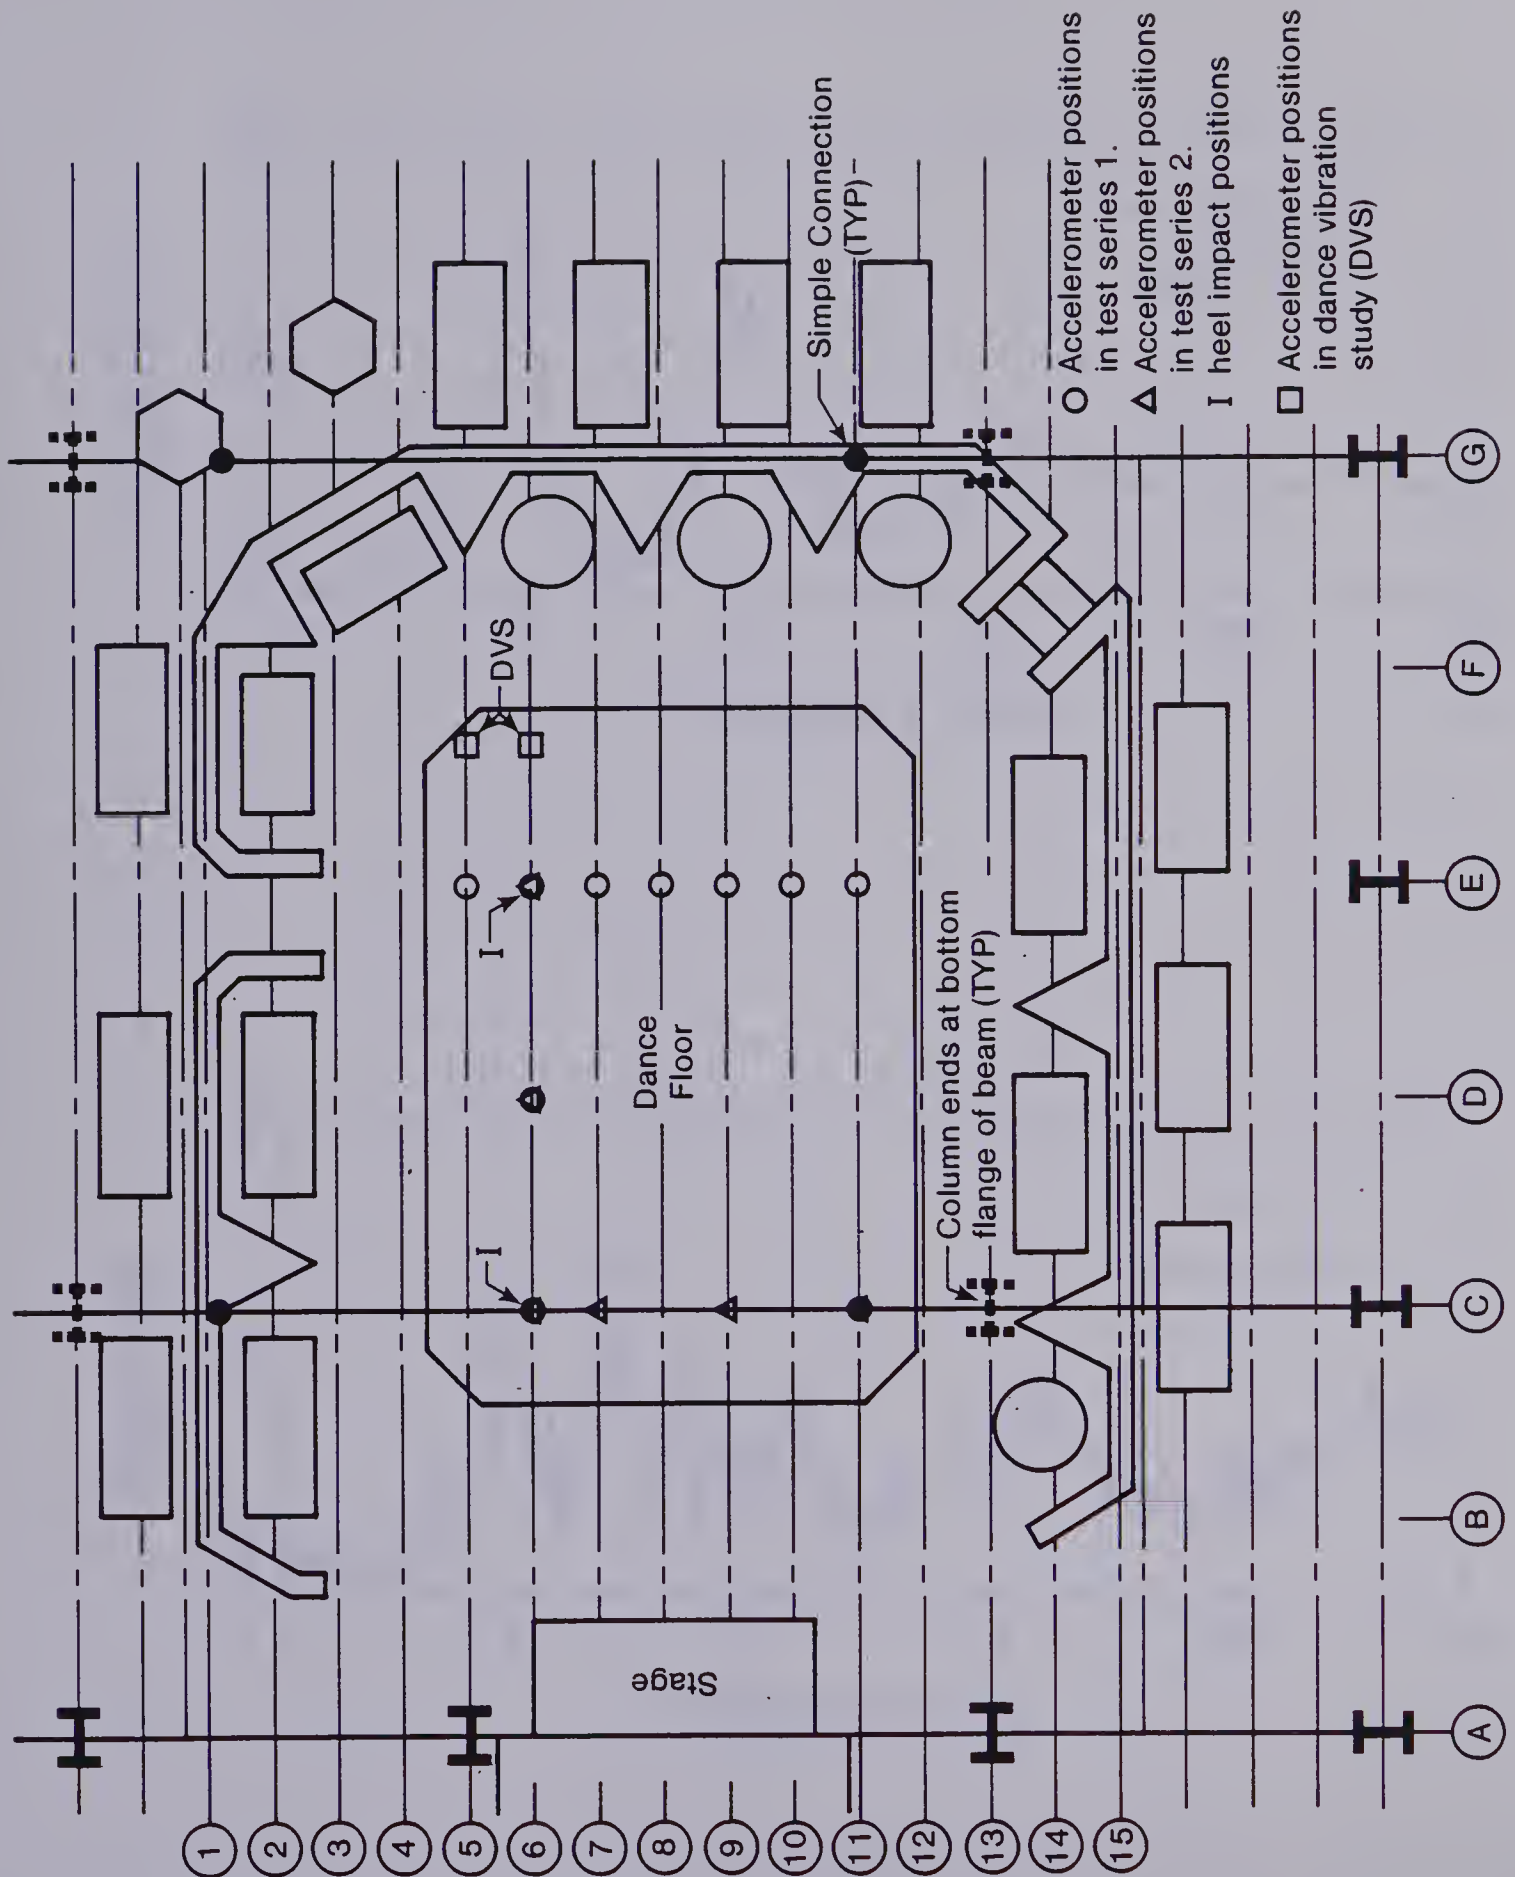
Detail Planview of Sunken Dance Floor Area
